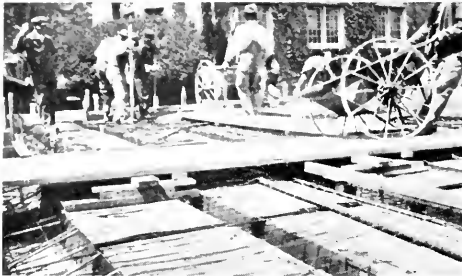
Forms for the floor slab of the rink, showing the reinforcement in place. In the background the concrete is being tamped thoroughly to insure a compact mass.
